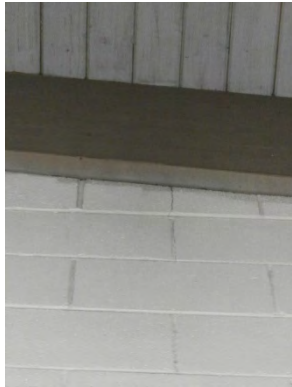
Diagonal Cracking in the East Wall of the Belt Press Hopper Room due to settlement
